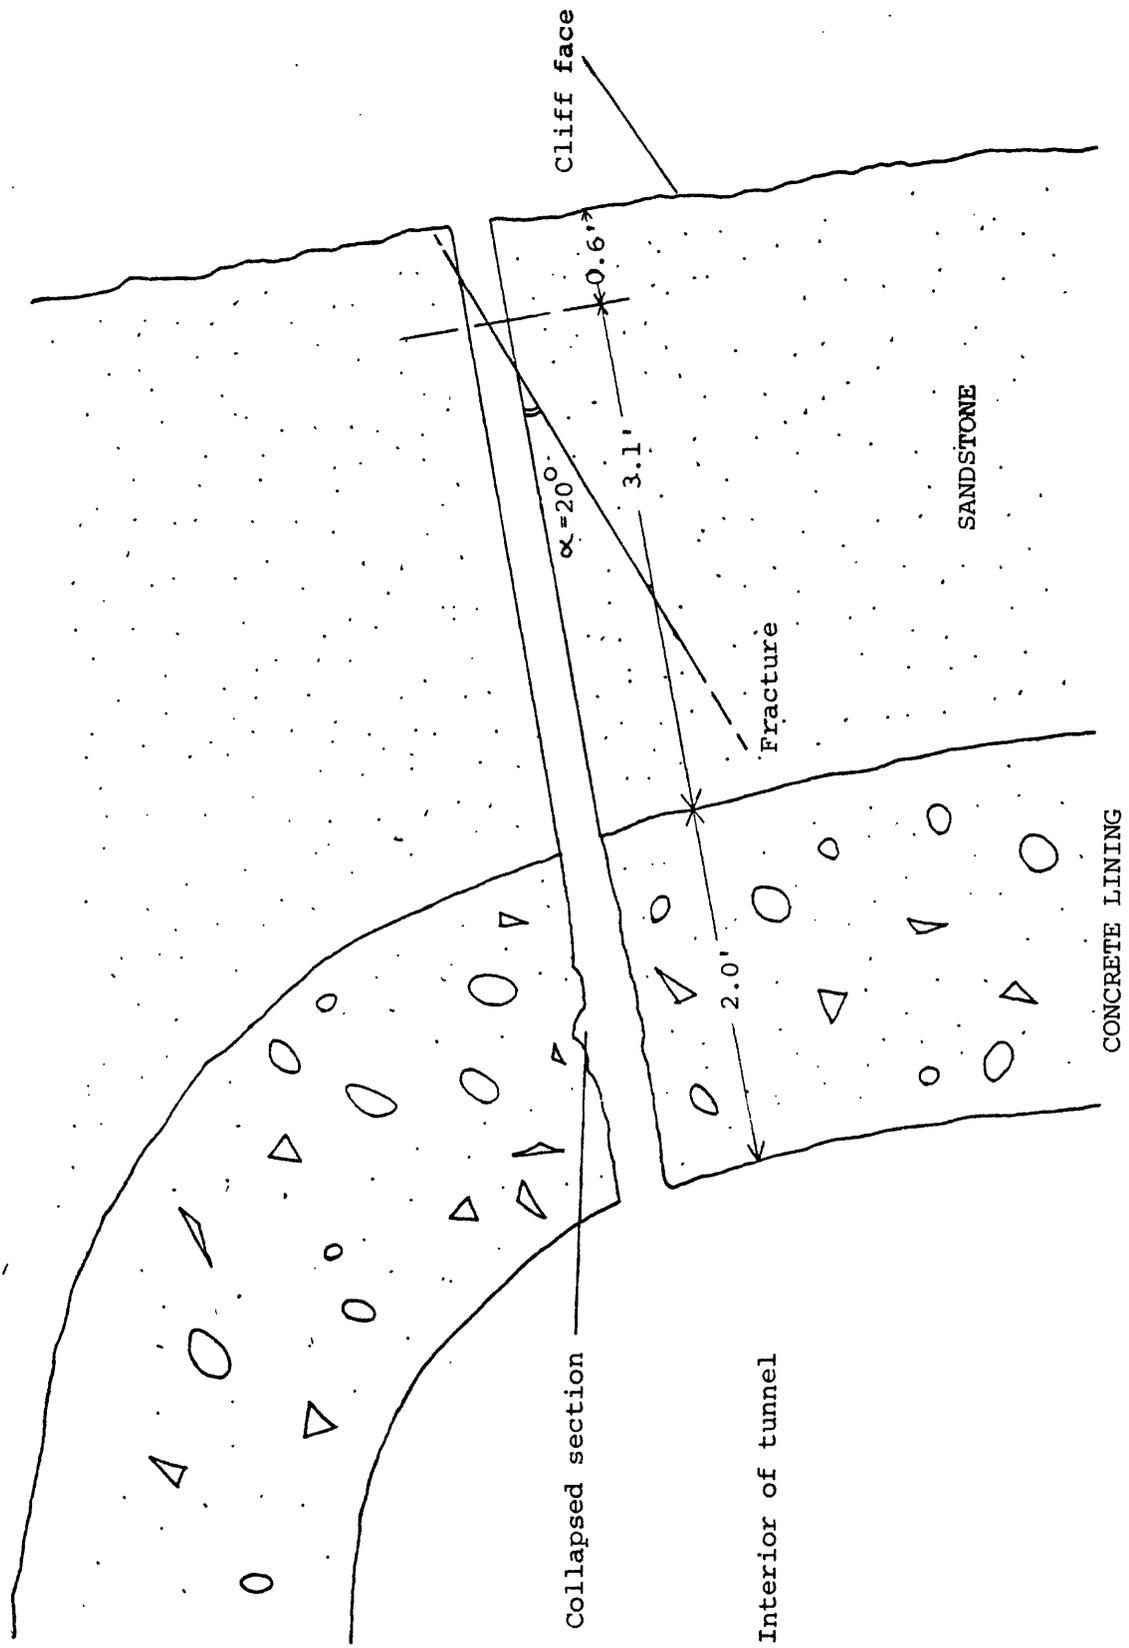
Schematic cross-section showing the 5.7 feet long unlogged hole in Mt. Carmel Tunnel. The packer overinflated in the collapsed concrete section, and only one fracture was mapped in this hole.
